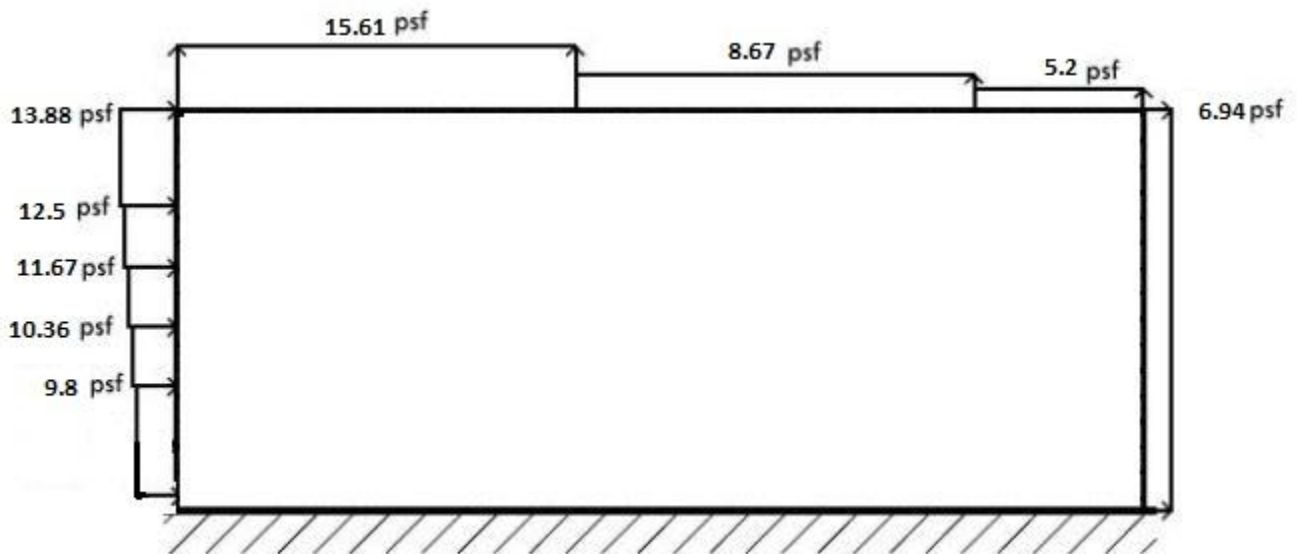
Wind Pressures acting on the East Wing, East and West facades
